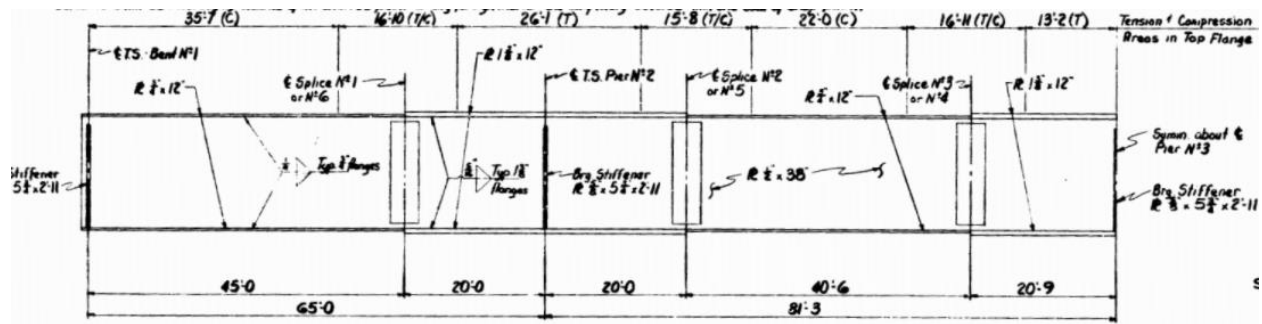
Typical Plate Girder Elevation of Structure 052-24-06649 (NBI 19430)
